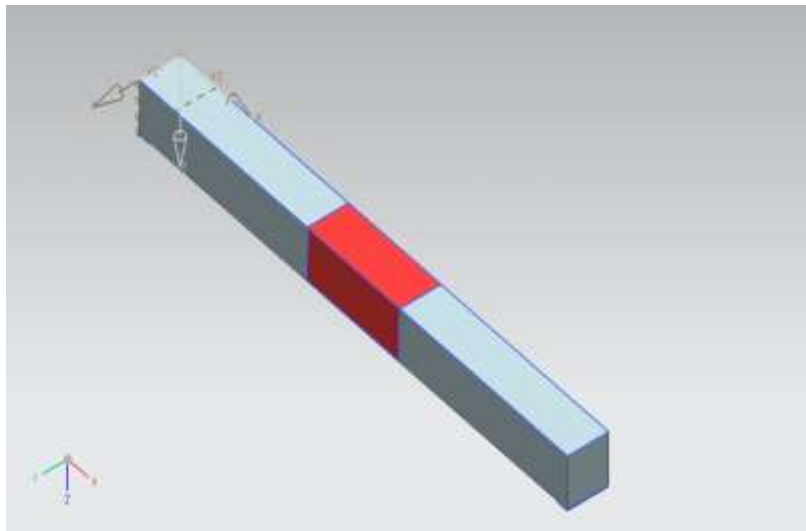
Base Model of beam section with FRP (length 2m) sheet
